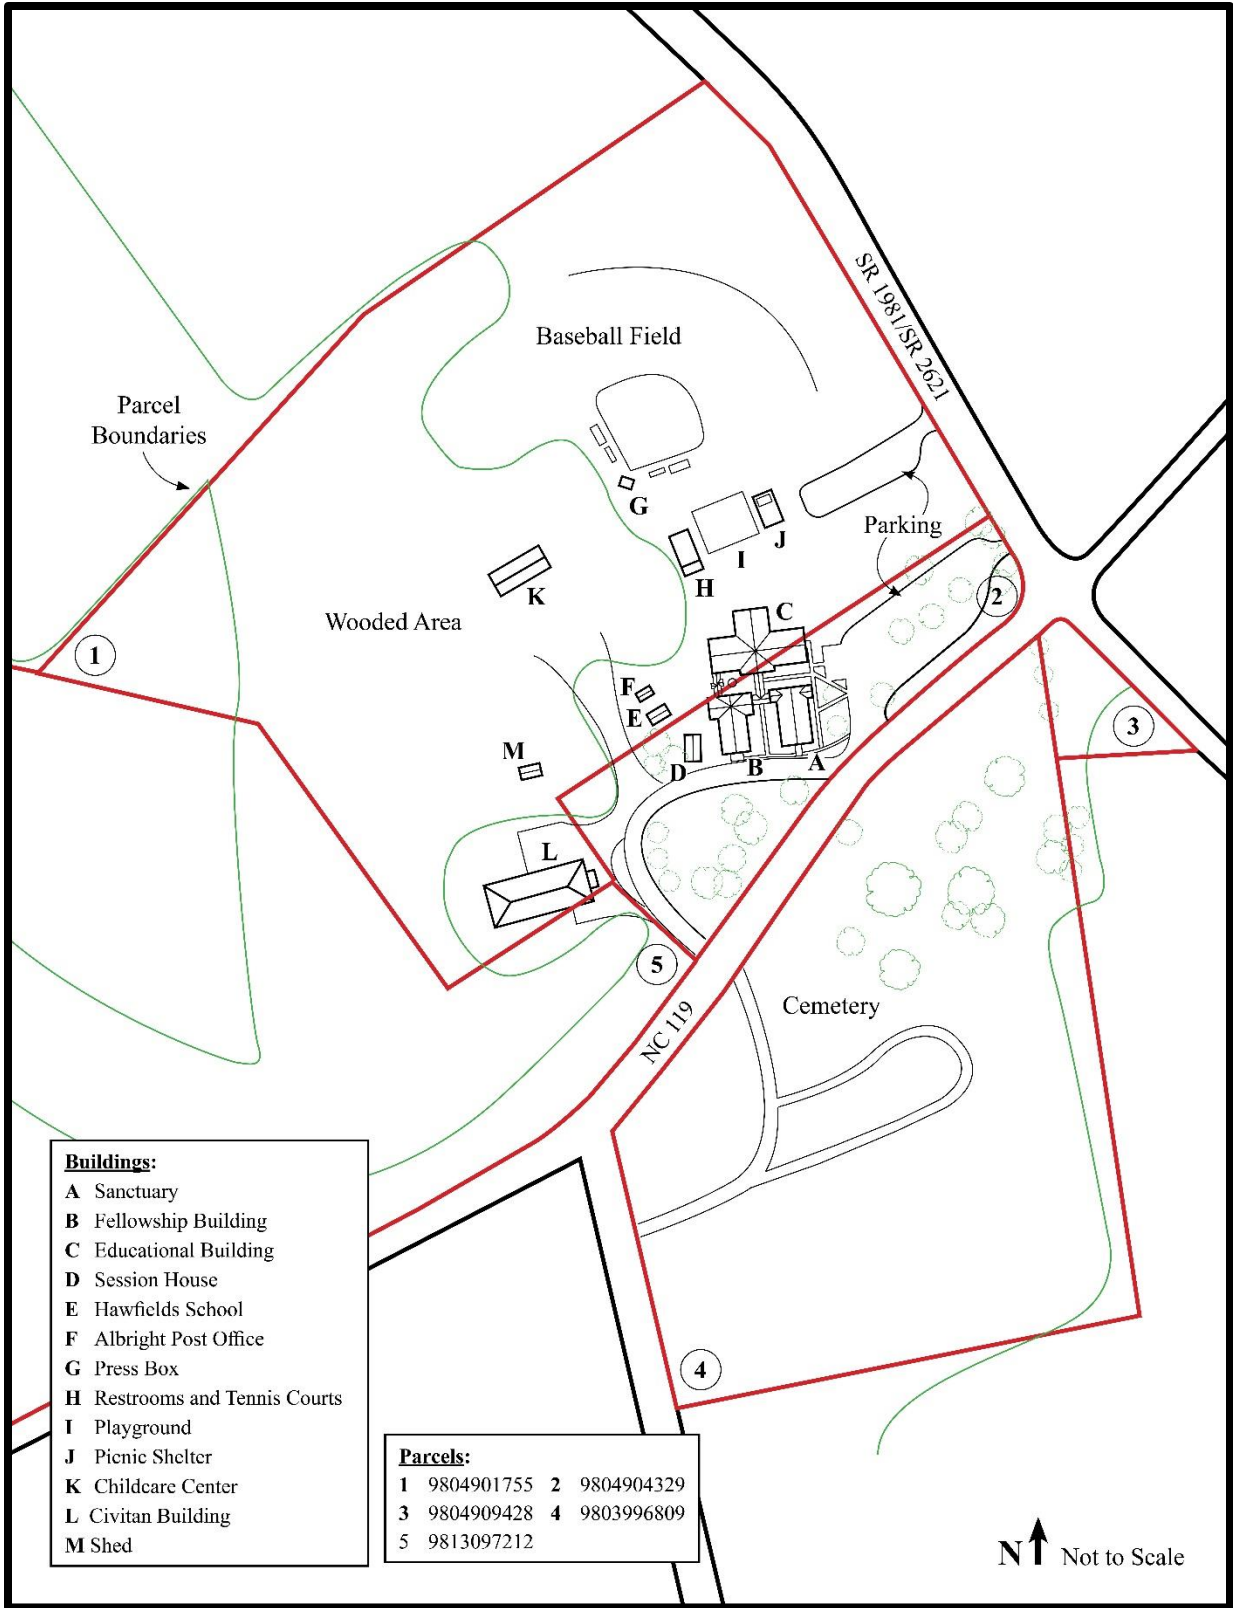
Site Plan, Hawfields Presbyterian Church Property.
